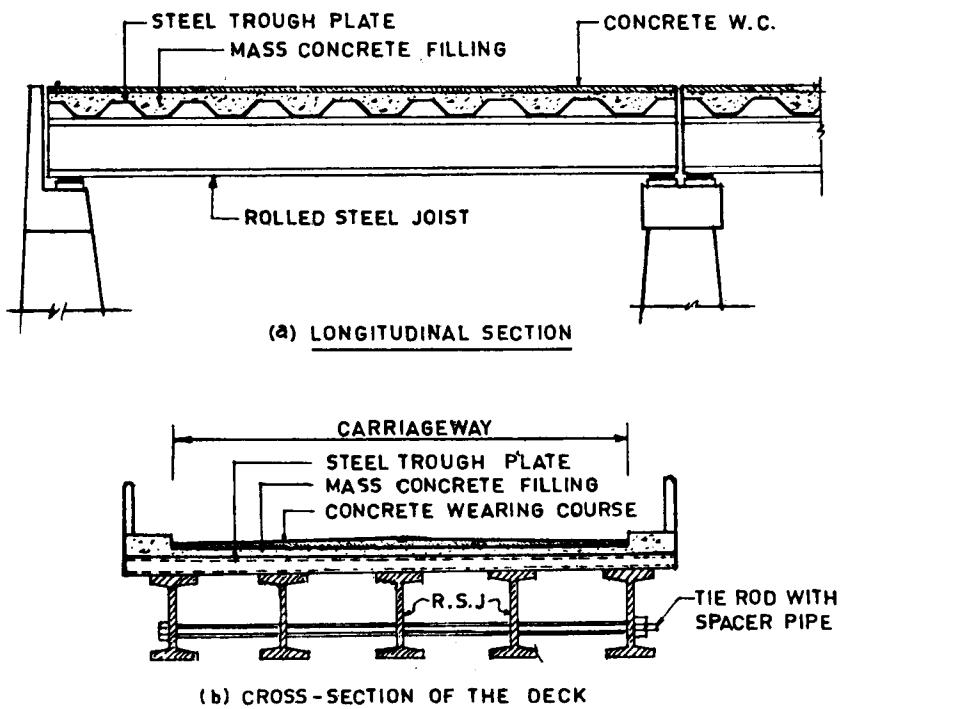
STEEL TROUGH PLATE WITH CONCRETE DECKING
